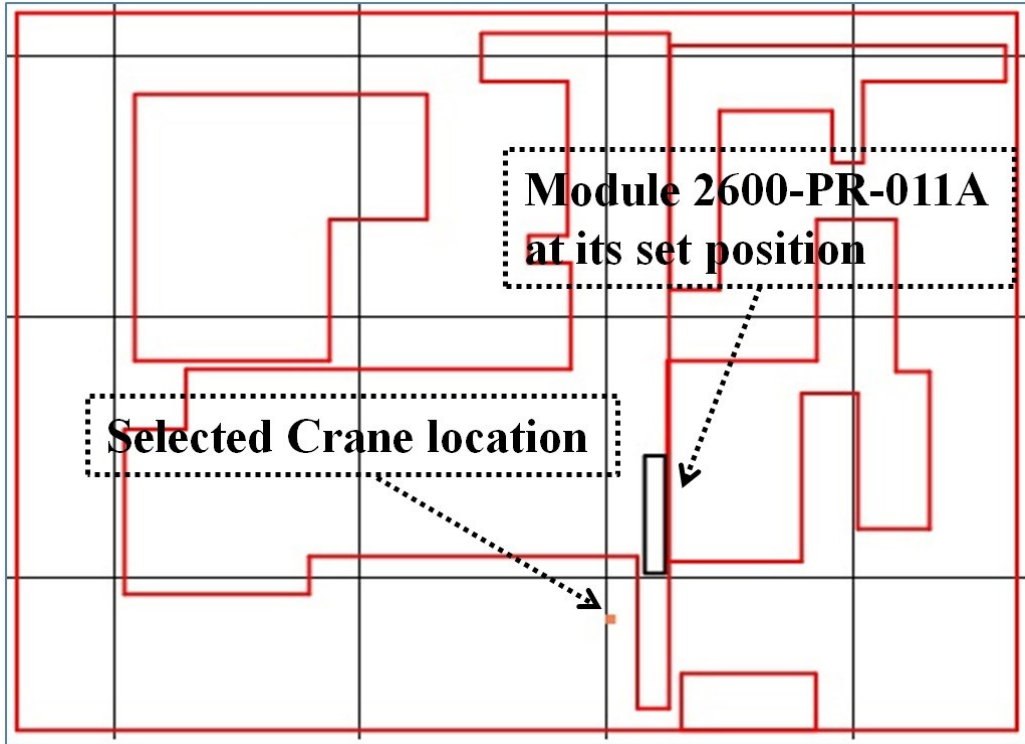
Case Two—scenario for multiple-elevation path checking
